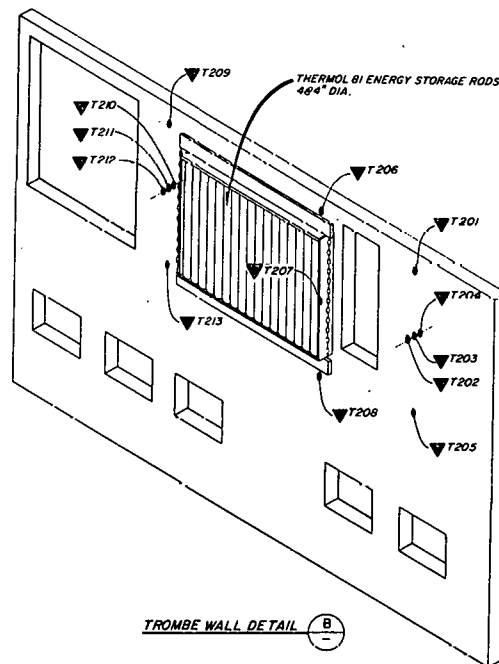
Baker Construction Solar Energy System Schematic, Trombe Wall Detail
